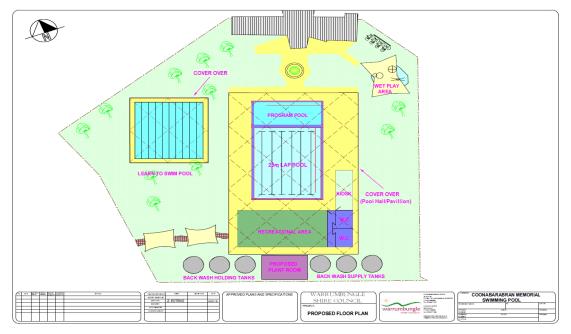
Proposed Coonabarabran Pool Facility Concept Plan
